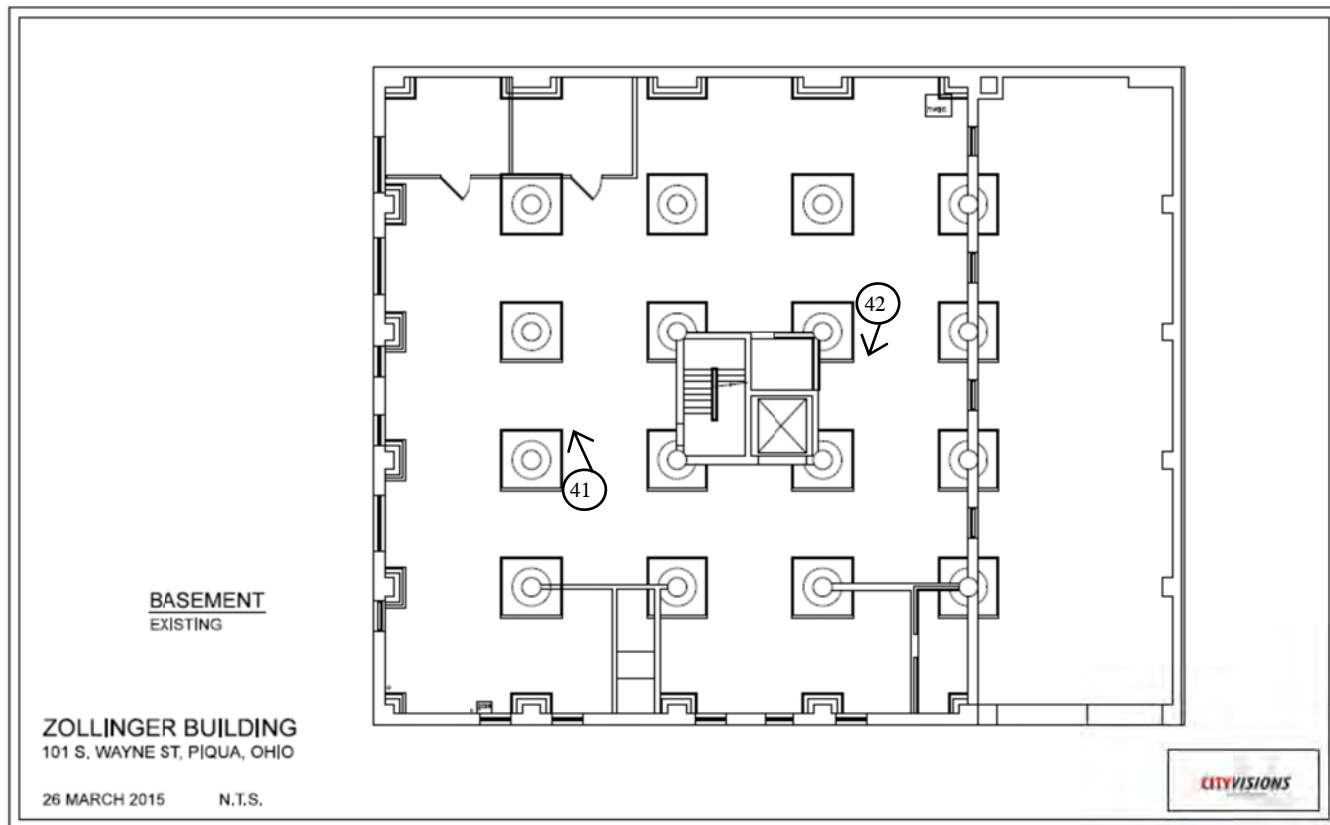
Existing Basement Plan, Zollinger Building, showing locations of photographs 41 and 42 (City Visions, Inc)
